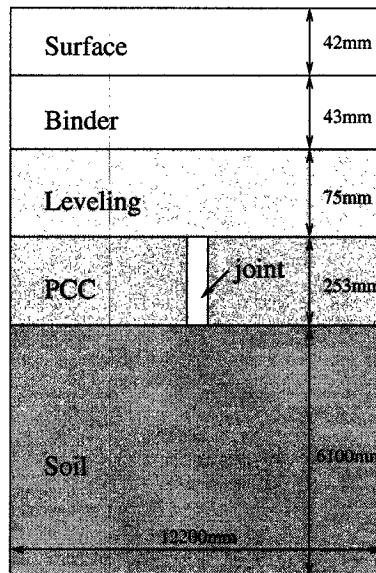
Schematic drawing of the pavement section in IOWA.
